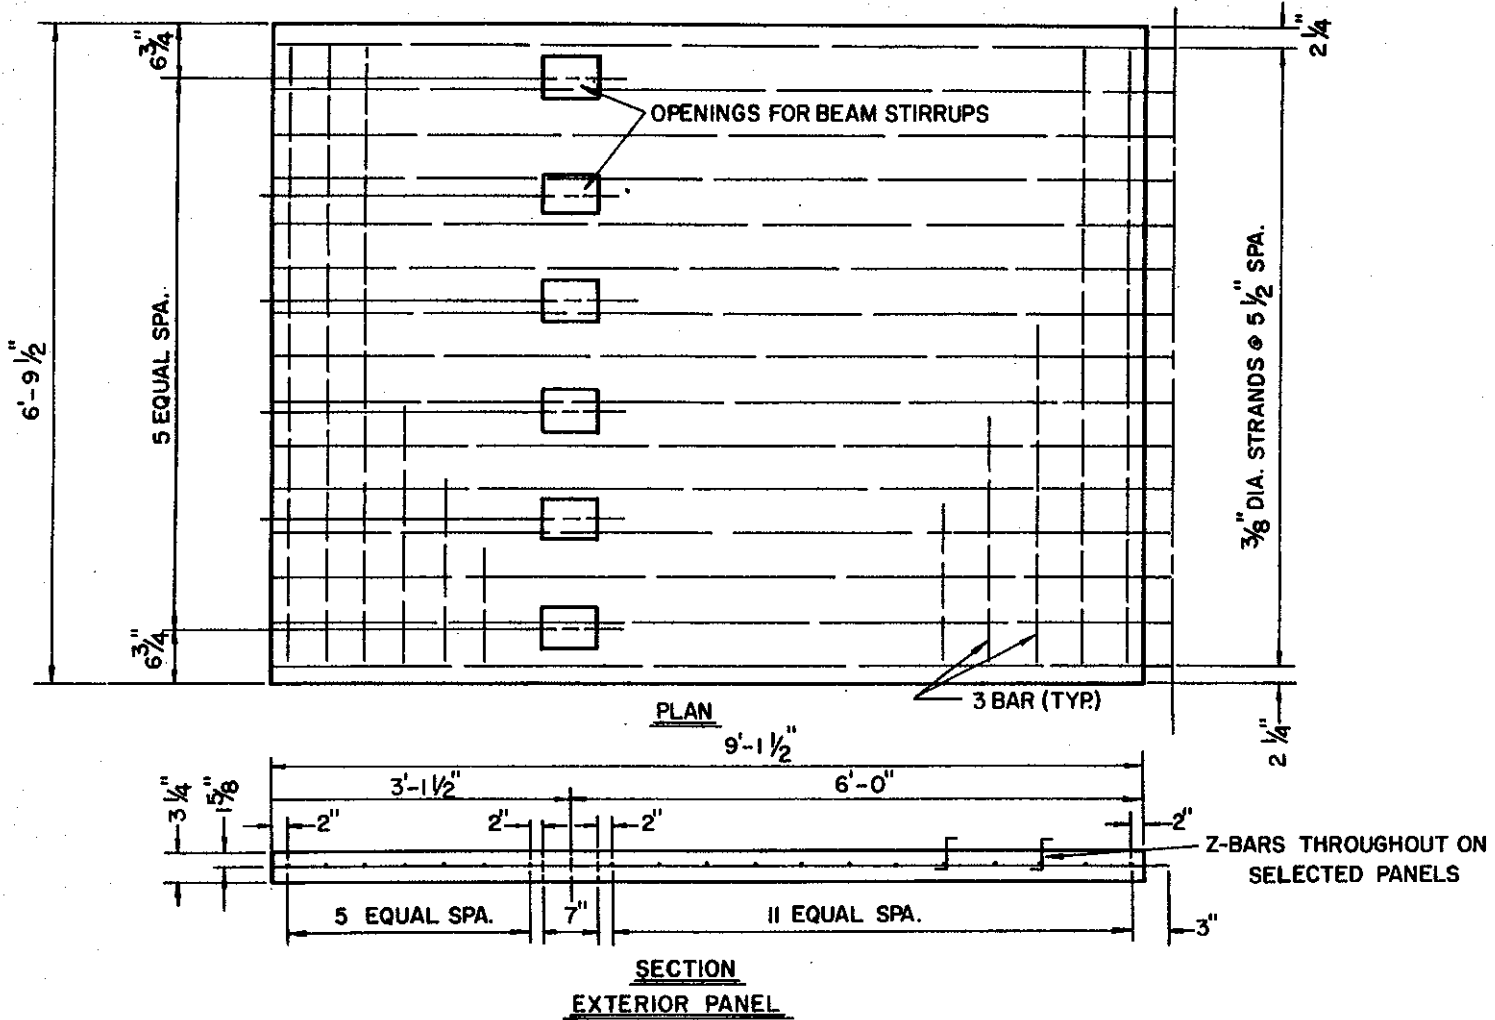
Details of Exterior Panels Used in Full-scale Bridge.
